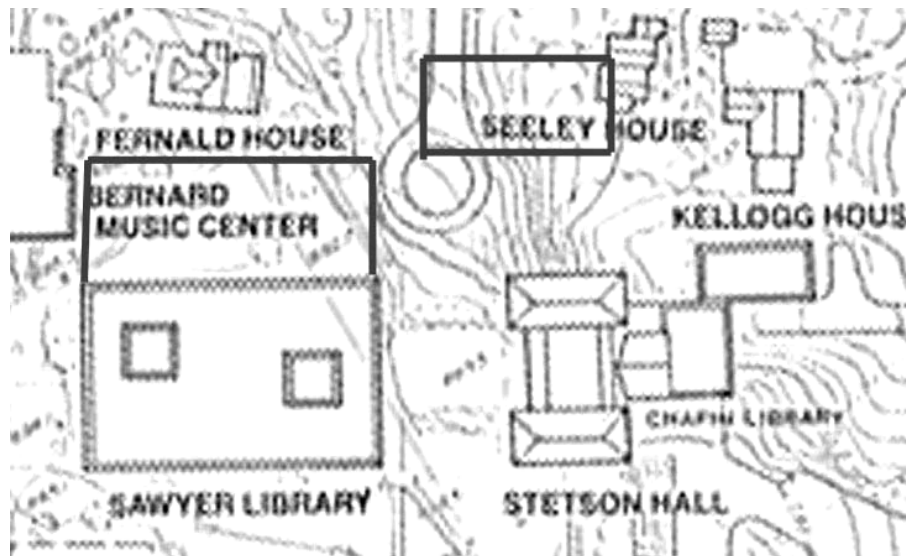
The new building set north of both Sawyer Library and Stetson Hall.
